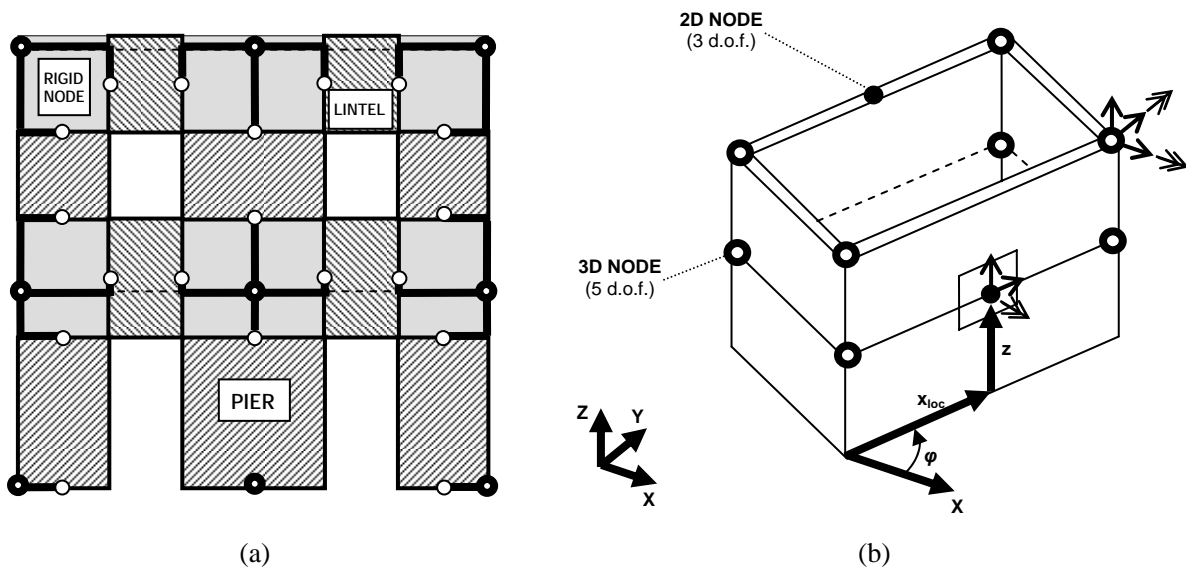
Macro-element modelling of a masonry wall (a); 3-D building model assembling (b).
